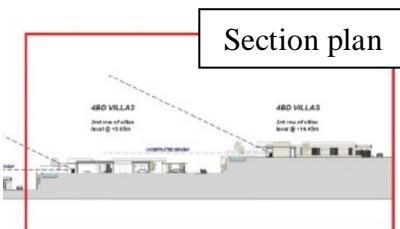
section plan for four-BEDROOM SIMPLEX VILLAS
